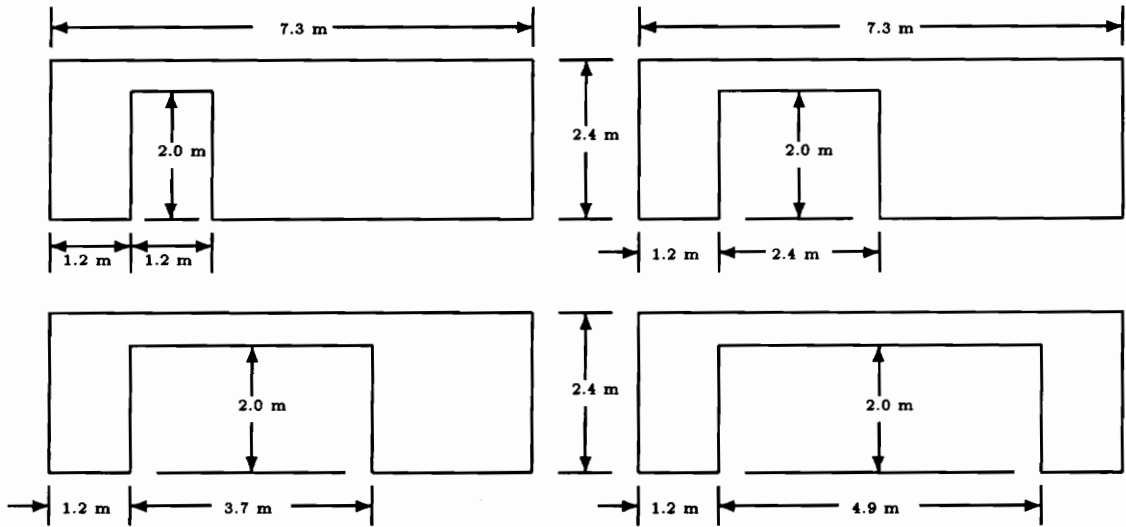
Dimensions of 2.4 m (8 ft) High Wall Models with Door Openings
